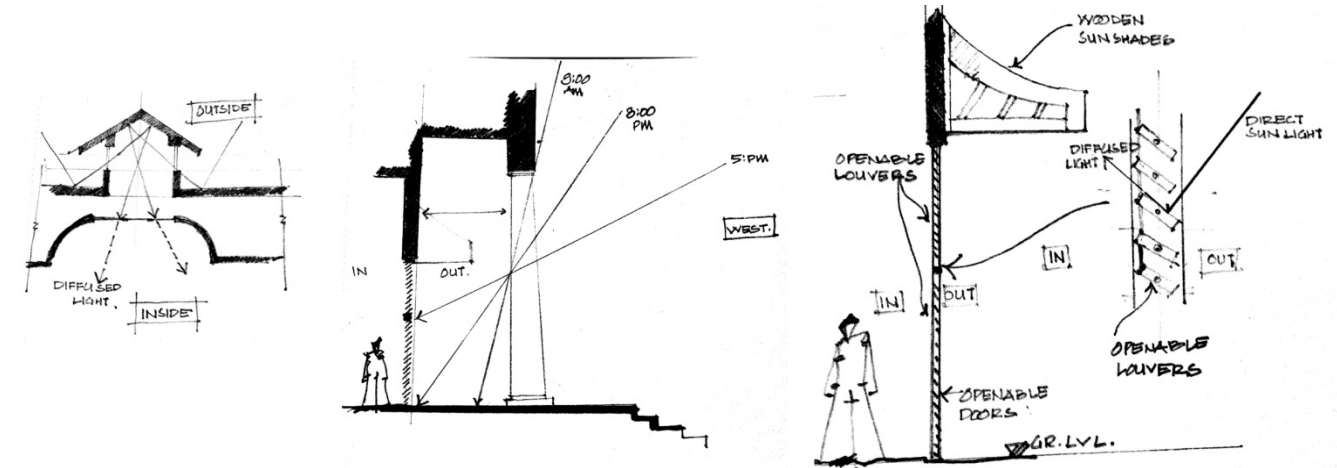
(a) The Lantern light located at the Central Grand Hall (Authors). (b) Sun angles at the west façade (c) Section showing the weather shade (Jhilmils) and louvers (Authors).
